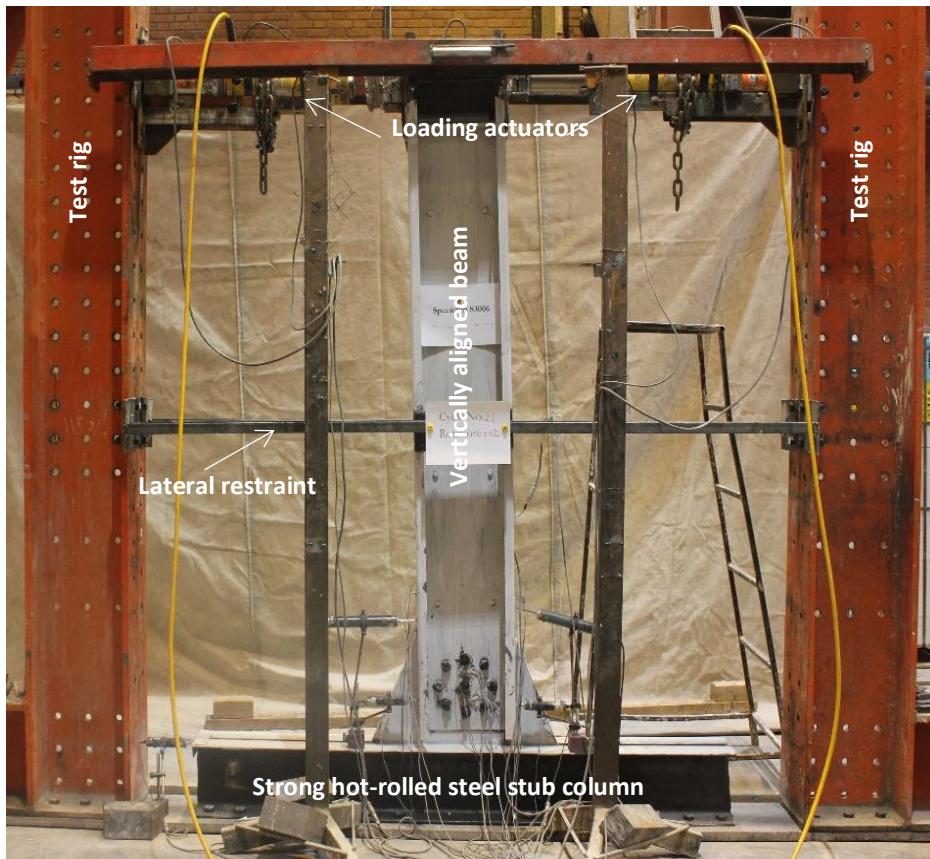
shows a drawing and a photo of the test set-up comprising a vertically aligned testing specimen supported by heavy hot-rolled steel sections and a strong floor, loaded at the free end through loading actuators supported by a test rig. The testing beam was bolted to the double back-to-back hot-rolled steel channel sections (using M24 bolts) which served as the stub column for the tested connections. The distance between the centre of the loading point to the face of the stub column was 2500 mm representing inflection point of a 5000 mm span moment frame under lateral loading conditions. The lateral restraint is provided at the mid-length of the beam to prevent any out-of-plane movement and lateral-torsional buckling effects on the beam behaviour.
